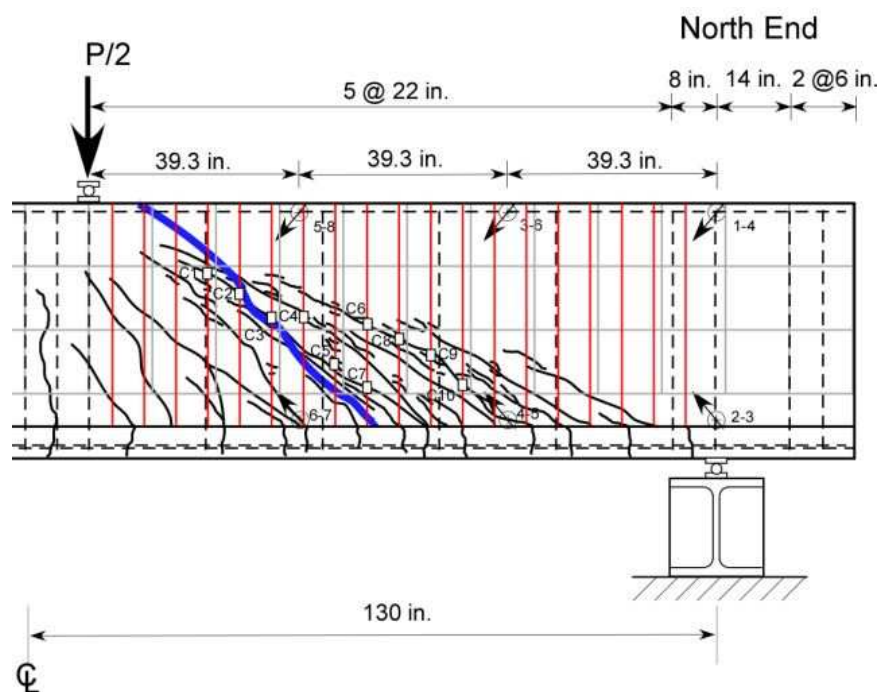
Specimen IT.7.18.6.FT crack map (failure test)
